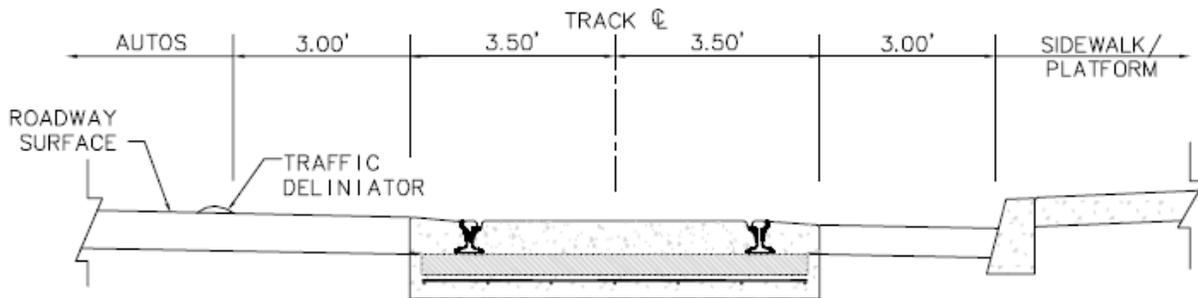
TYPICAL EMBEDDED TRACK SECTION, DOWNTOWN
